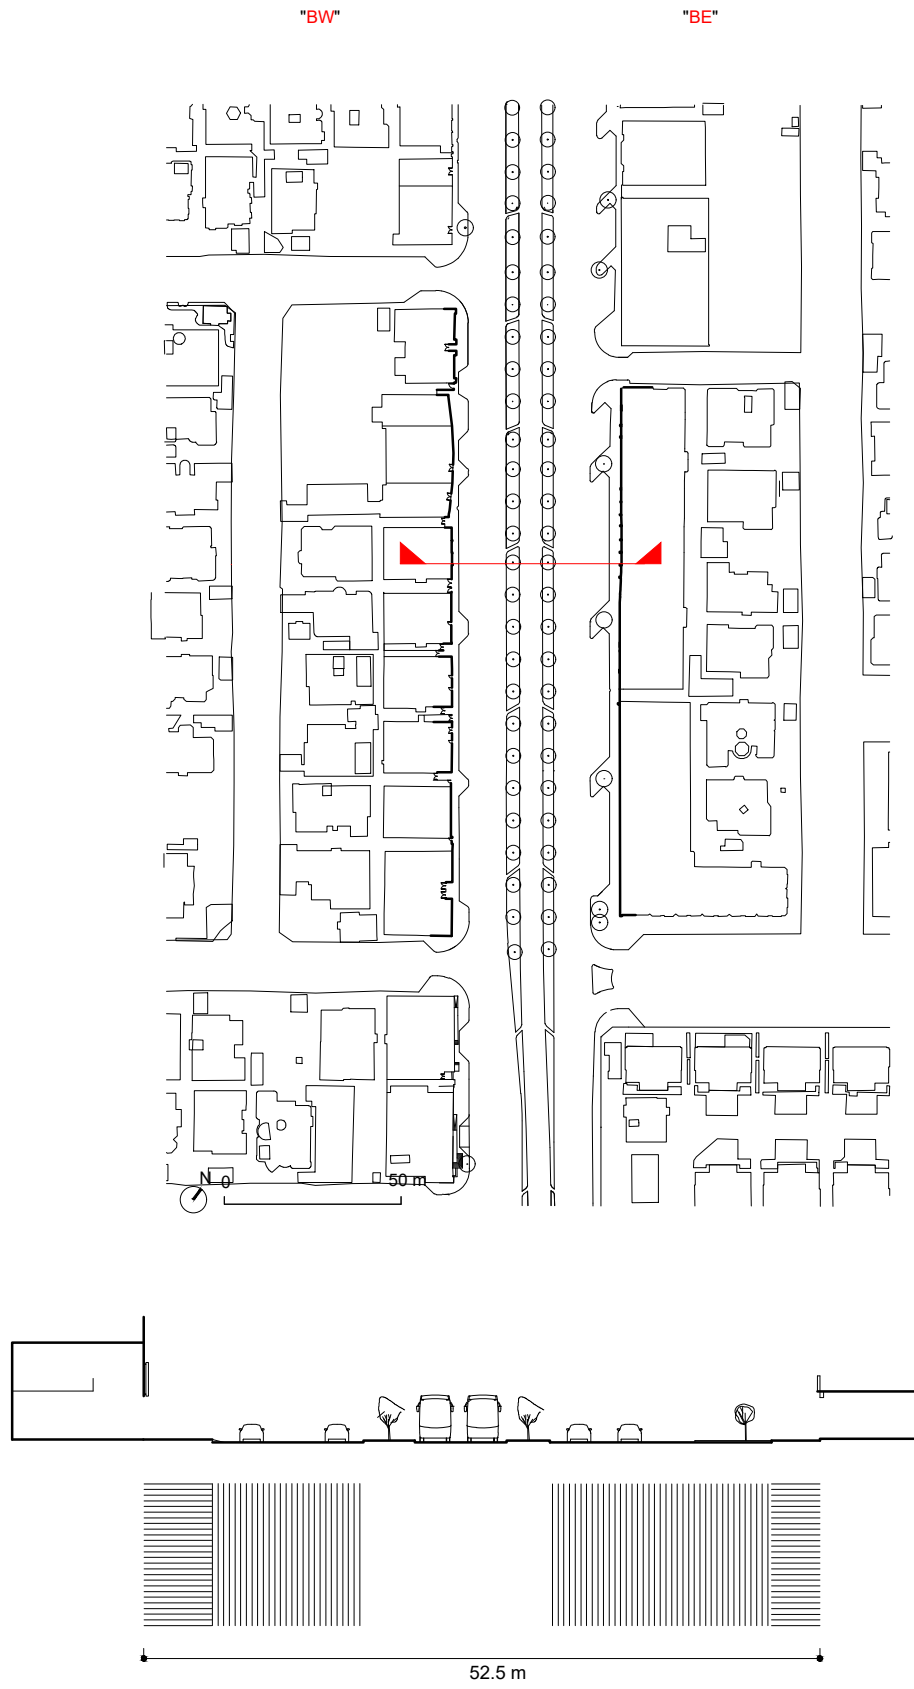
Khalid bin Al-Waleed Street: Plan and cross-section of sample "B." (Source: Author's Edition).
